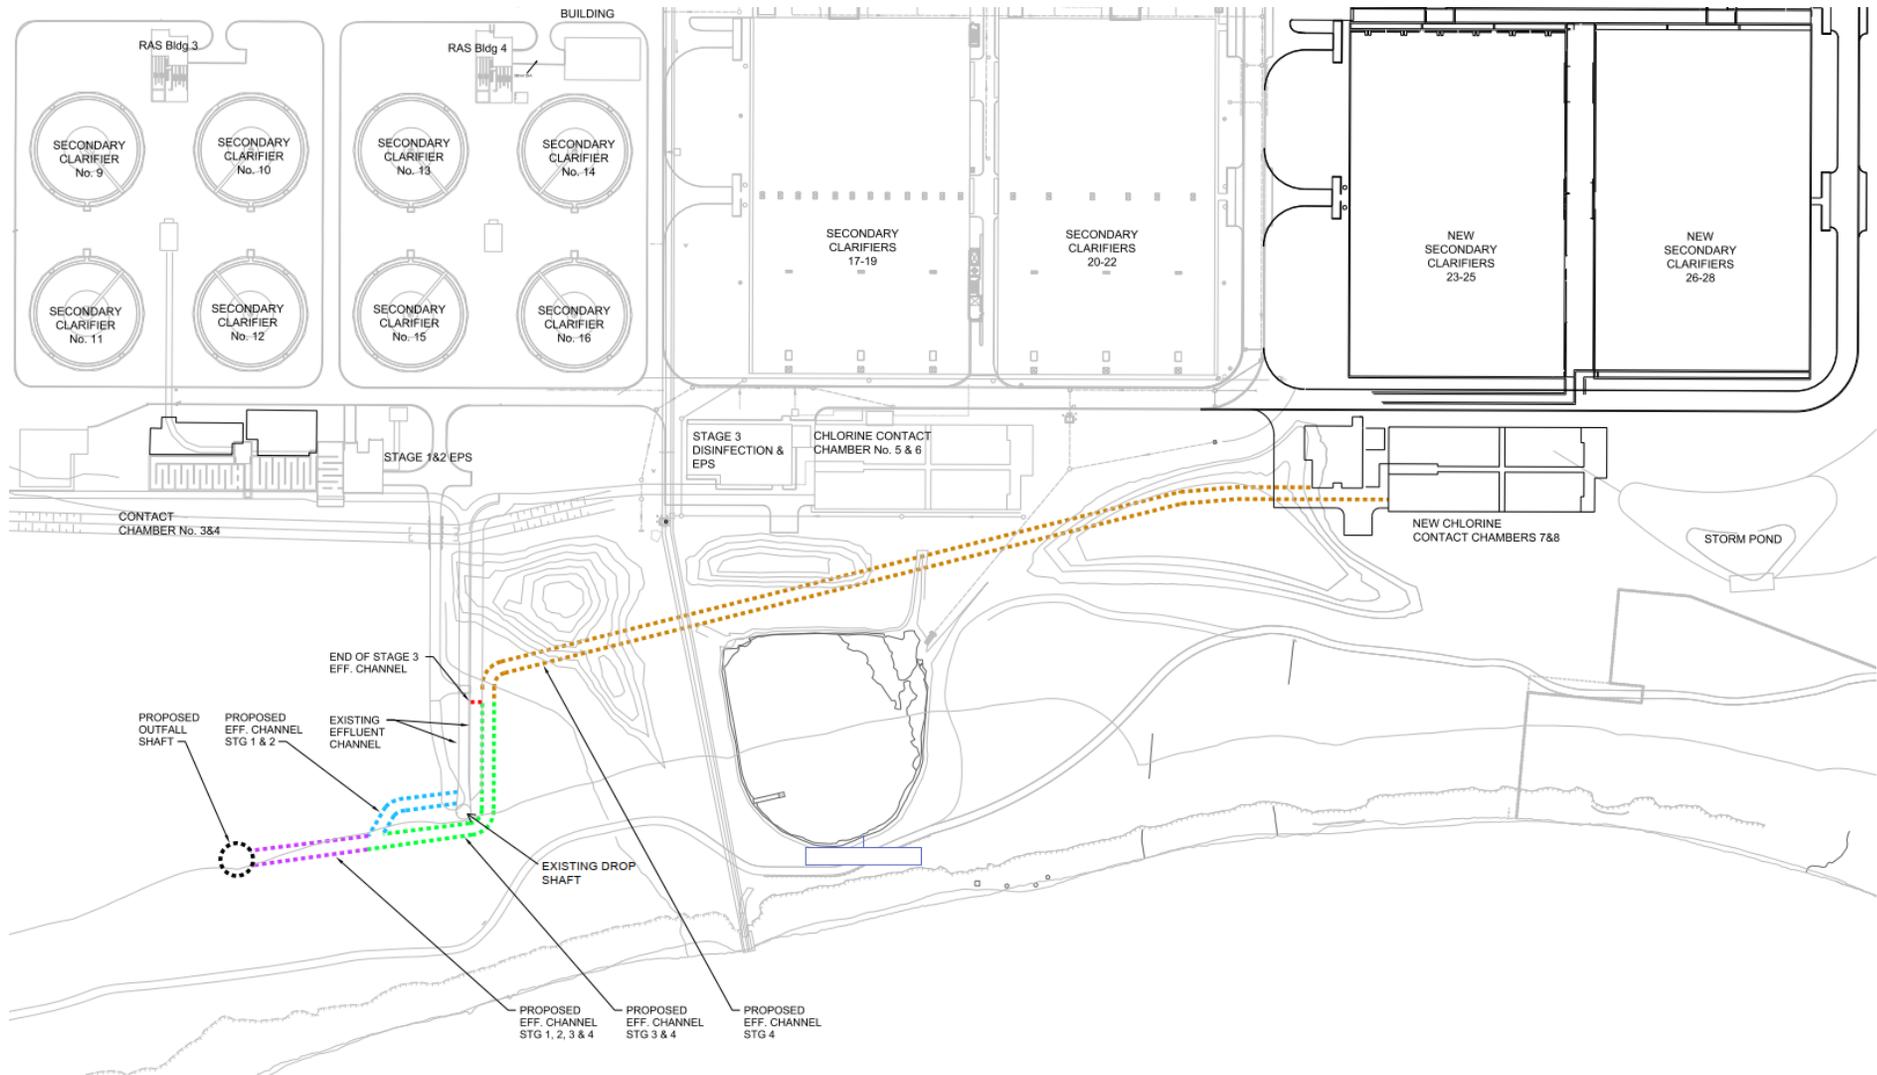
Conceptual Plan of Effluent Channels Connections to Drop Shaft
